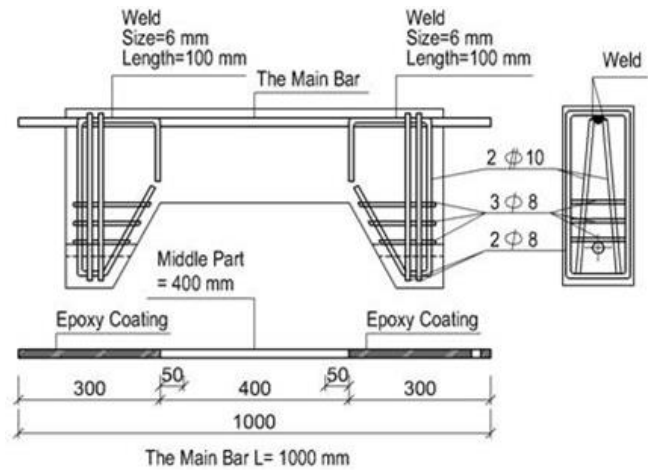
Reinforcement Details of loaded R.C. Beams used in Phase(I) (all dimensions are in mms)
